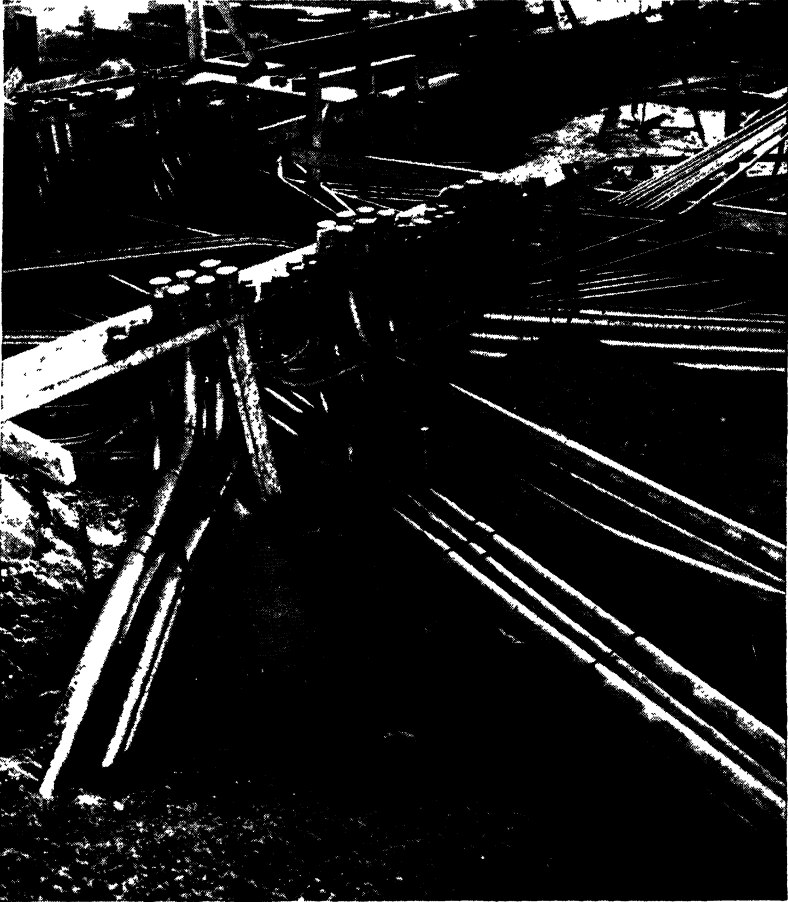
An Under-Floor Conduit Installation Before Concrete Has Been Completely Poured.
